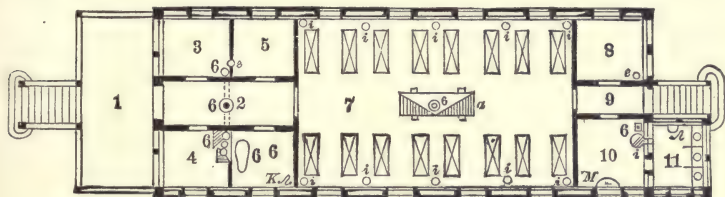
FLOOR PLAN OF ST. PETERSBURGH CITY HOSPITAL.
